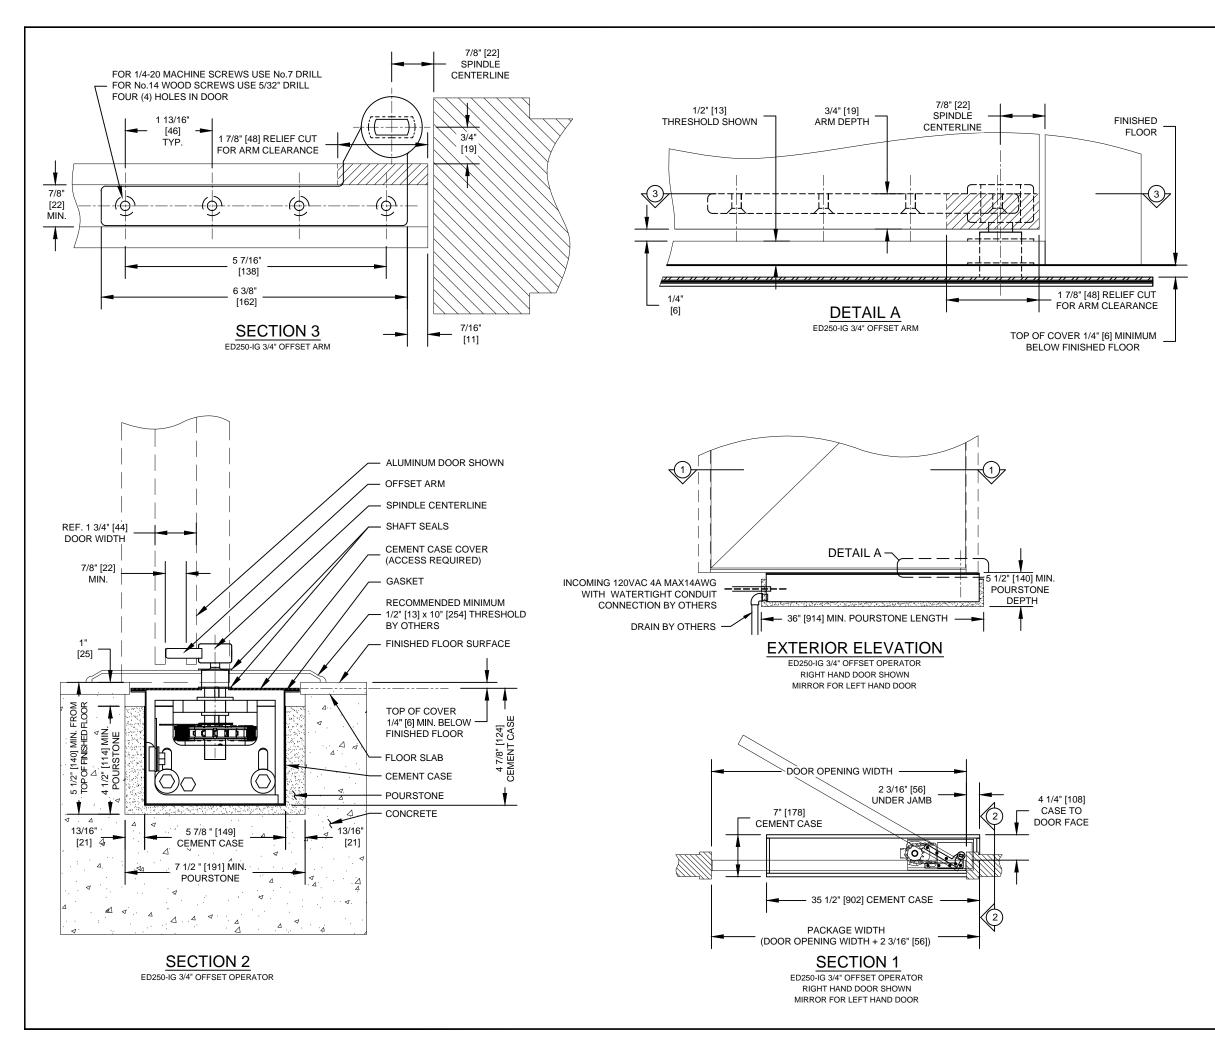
Drawing Title: ED250 IG AUTOMATIC SWING DOOR
